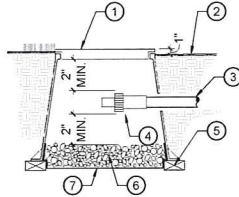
| INLINE DRIP LAYOUT
